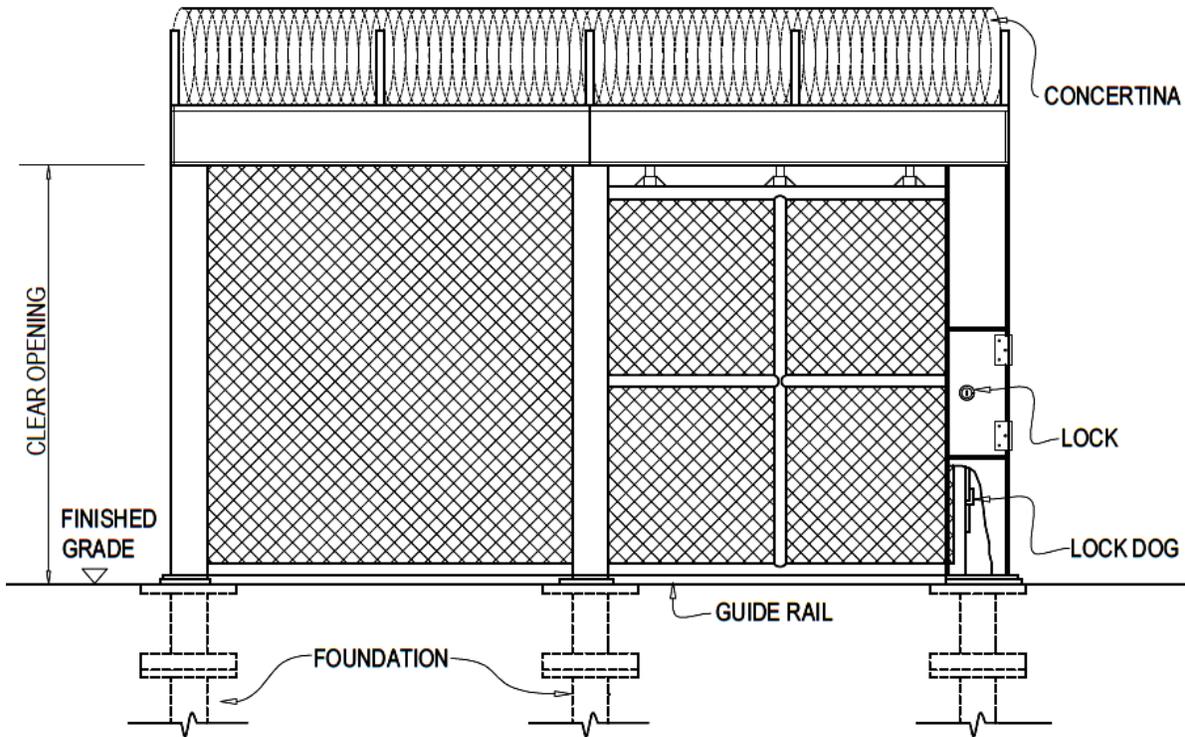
TYPICAL SALLY PORT ARRANGEMENT
